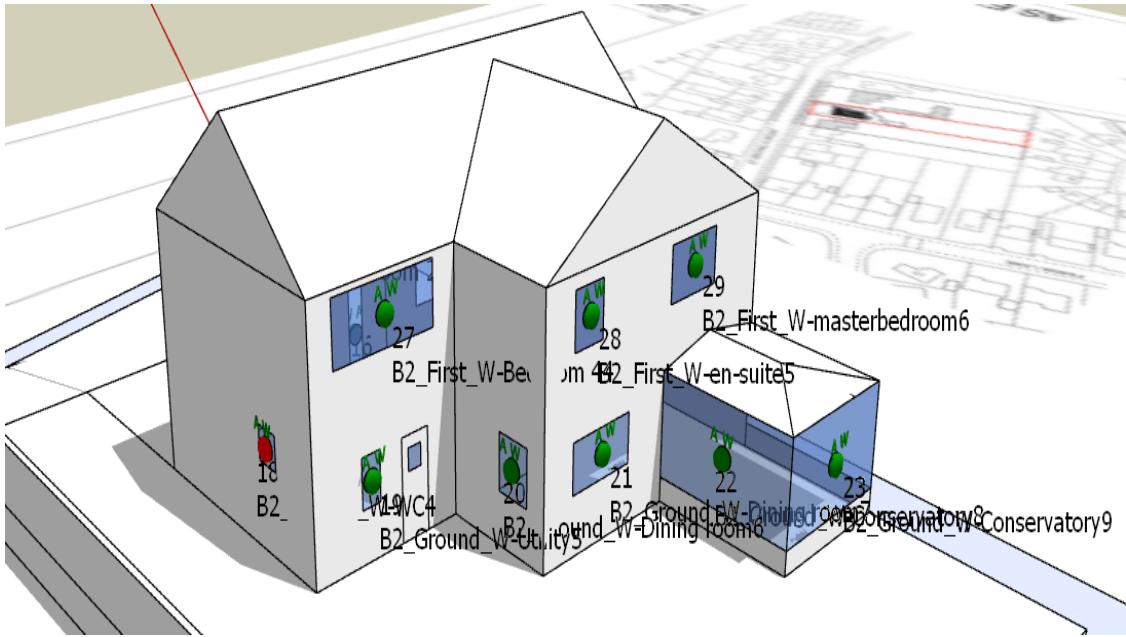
Surrounding Buildings B2-windows to be assessed – Rear & side elevation of 12 St Michaels Mount
